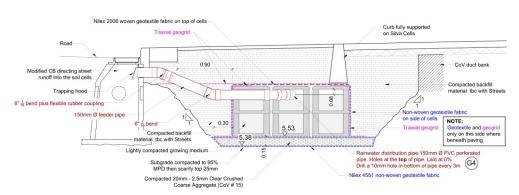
Typical, Stormwater tree trench with soil cell
